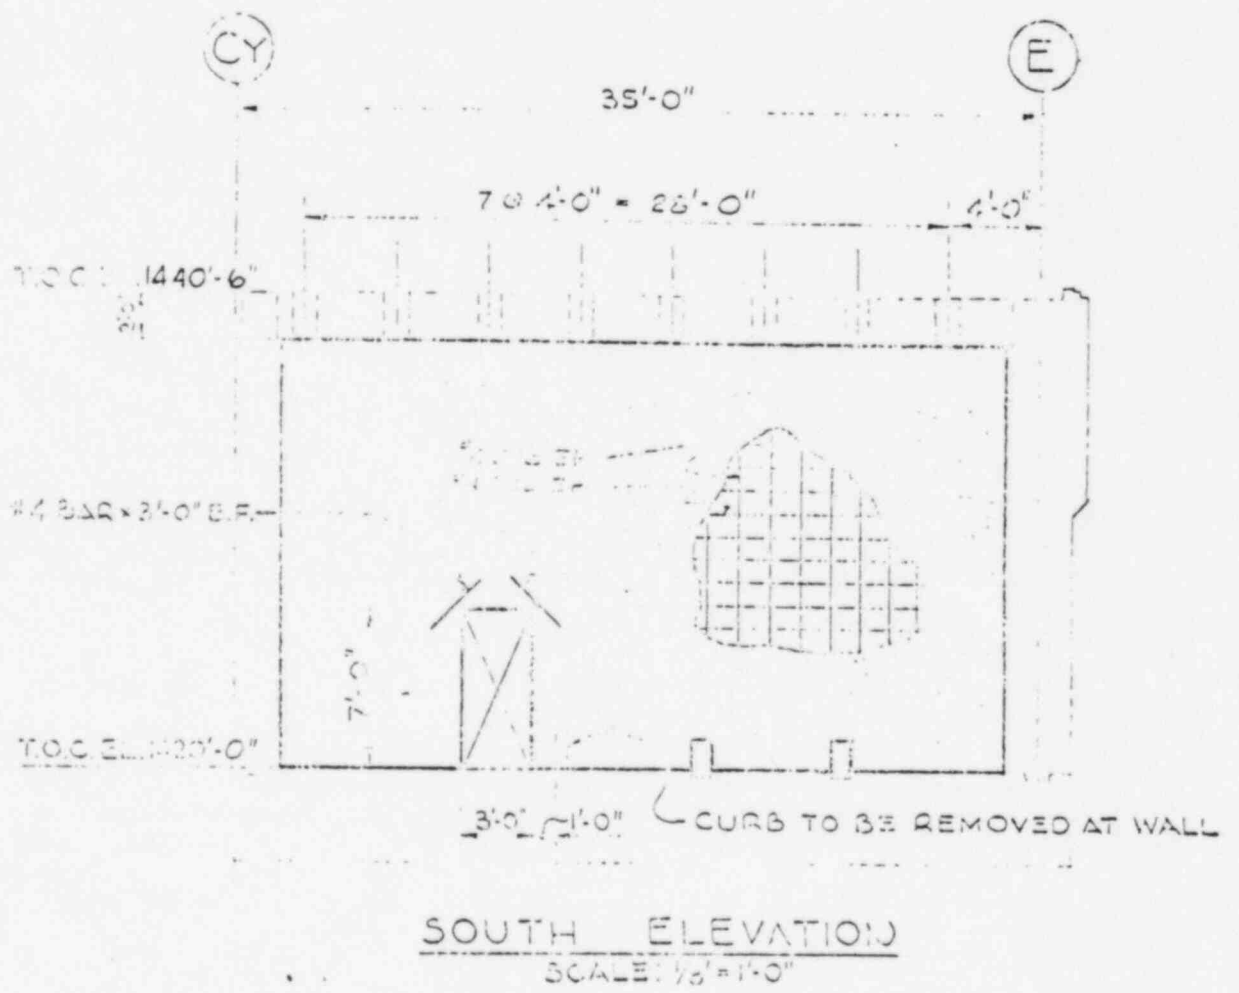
12-in. Wall in Secondary-Sodium Tank Area
